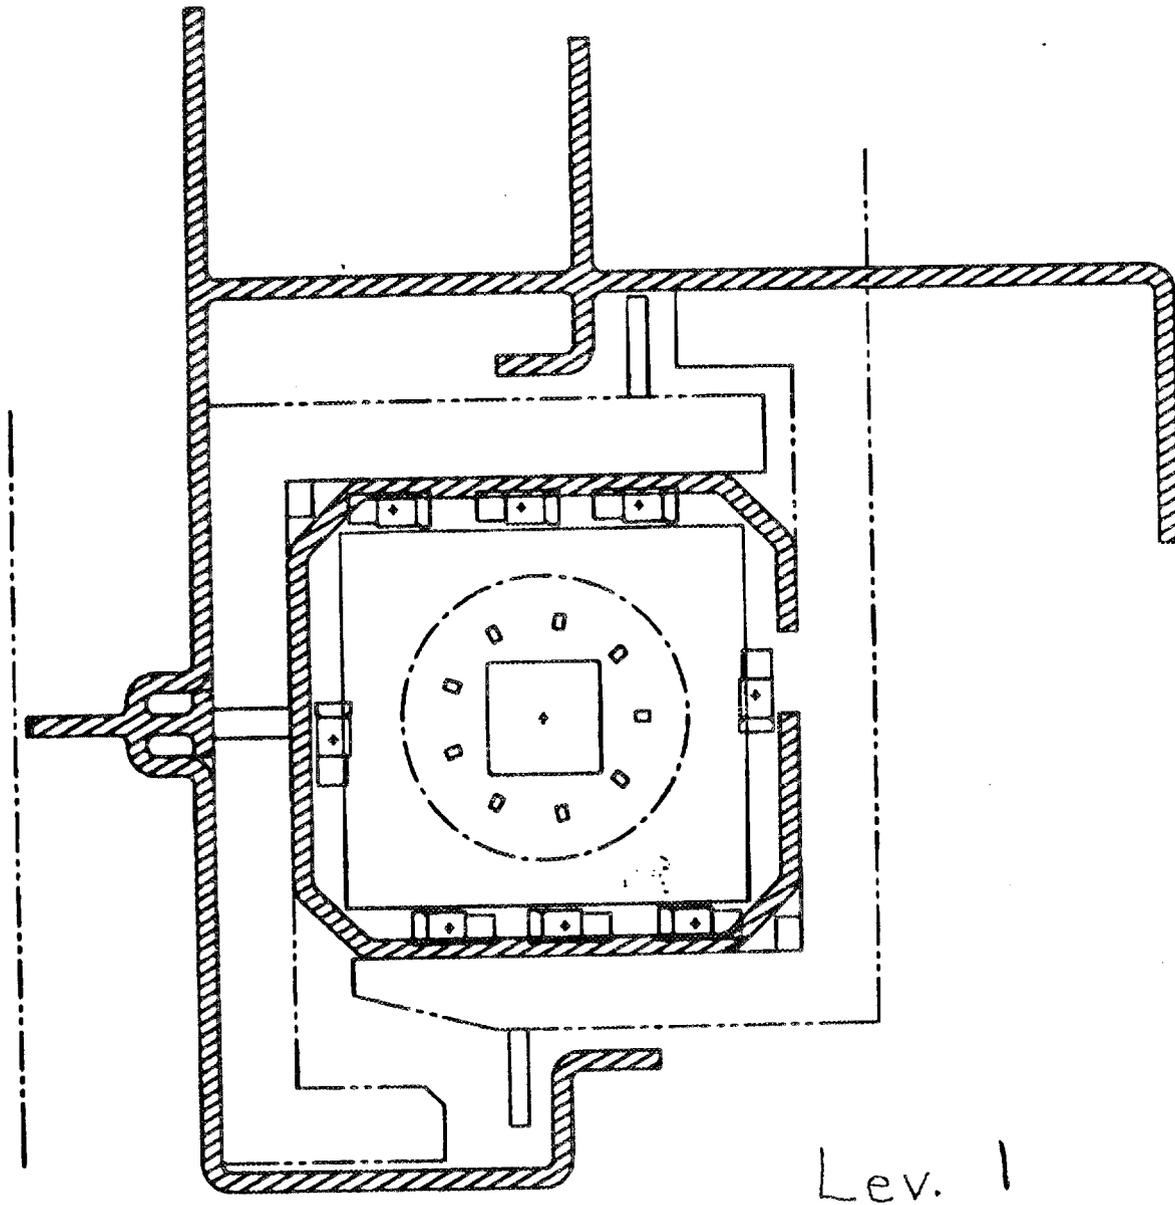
CABLE TRAY -- TEST SUPPORT BUILDING -- LEVEL ONE
